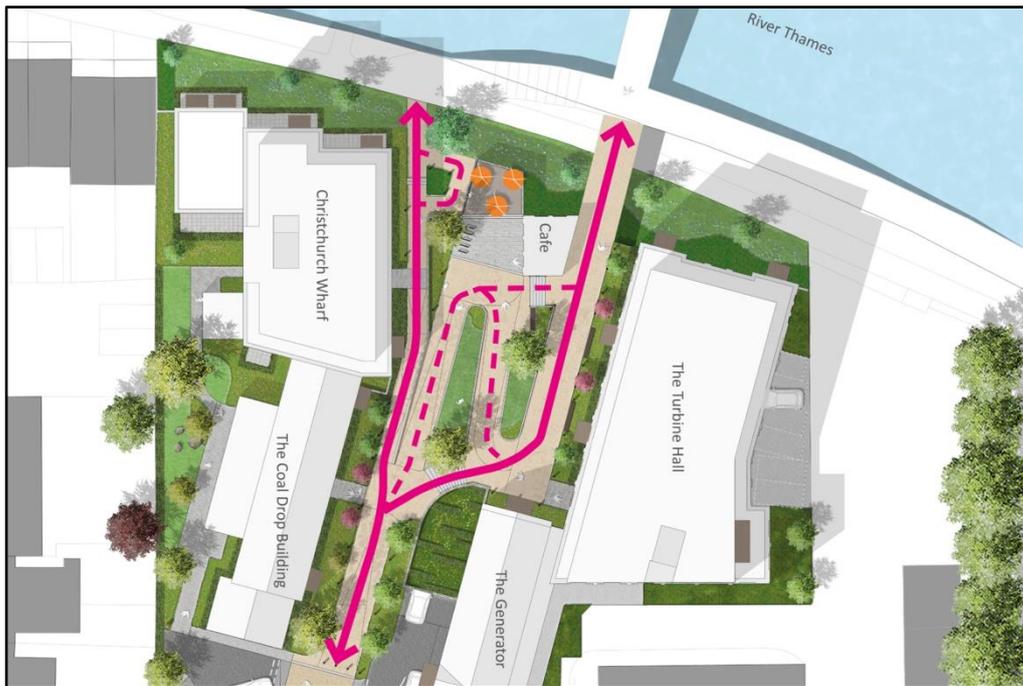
Plan demonstrating “direct” pedestrian routes to the towpath and Christchurch Bridge (solid line) in addition to ramped / alternative routes which also connect to the café (dashed line).
